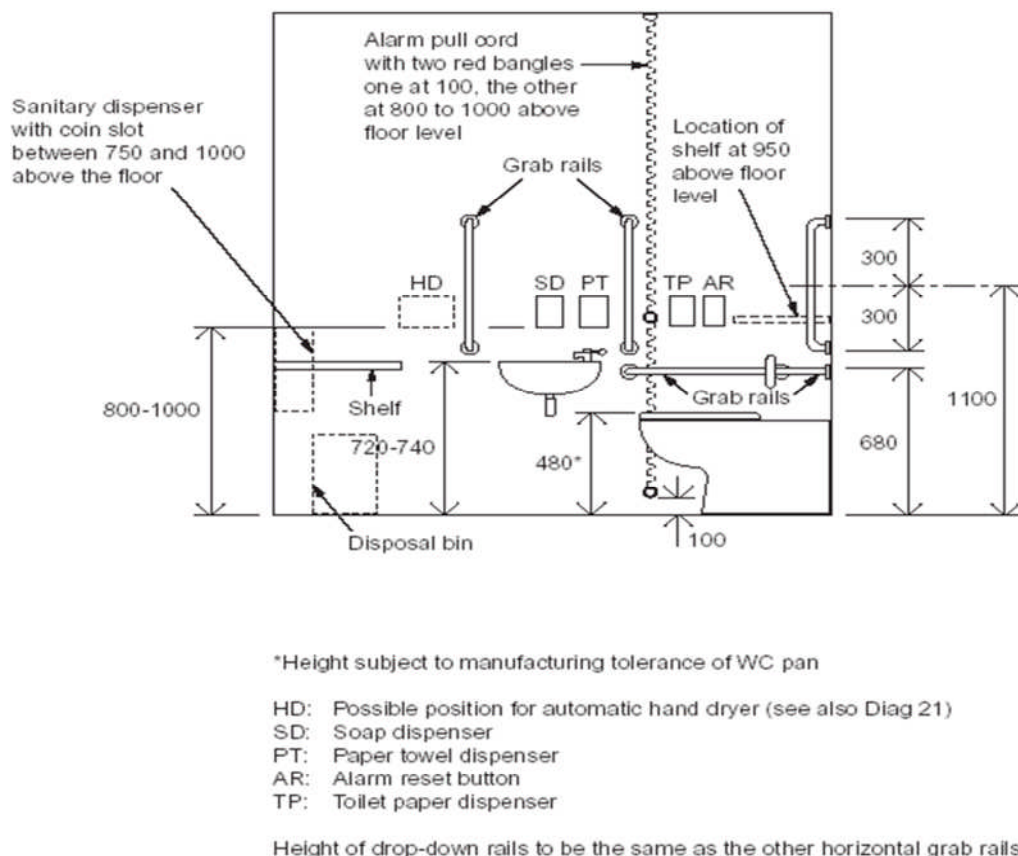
Height restrictions for bathroom layout (source: Approved Document M)
